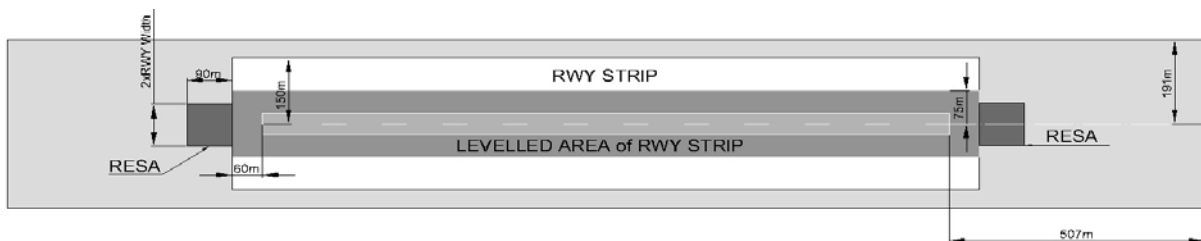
Depiction of Runway, Runway strip and RESA + an area proposed by this study (light grey)
